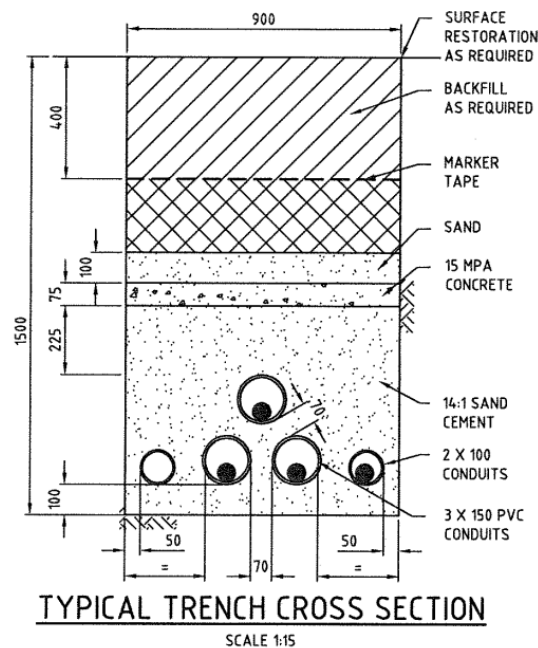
As built documentation showing existing 132kV transmission cable typical trench detail.
